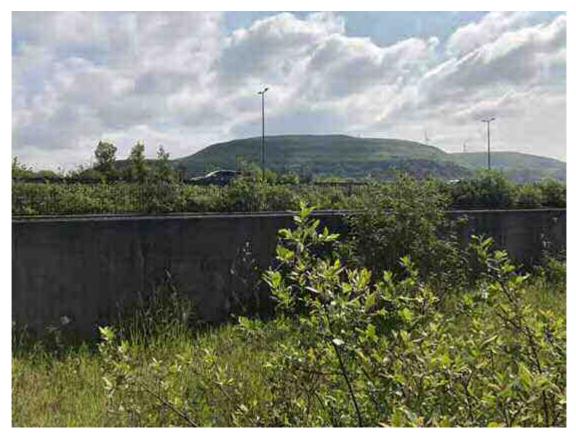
View facing south, towards BT service cover located parallel to existing access road.
